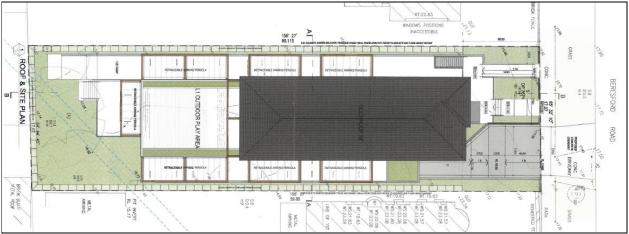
Extract from architectural drawings (Roof & Site Plan)
